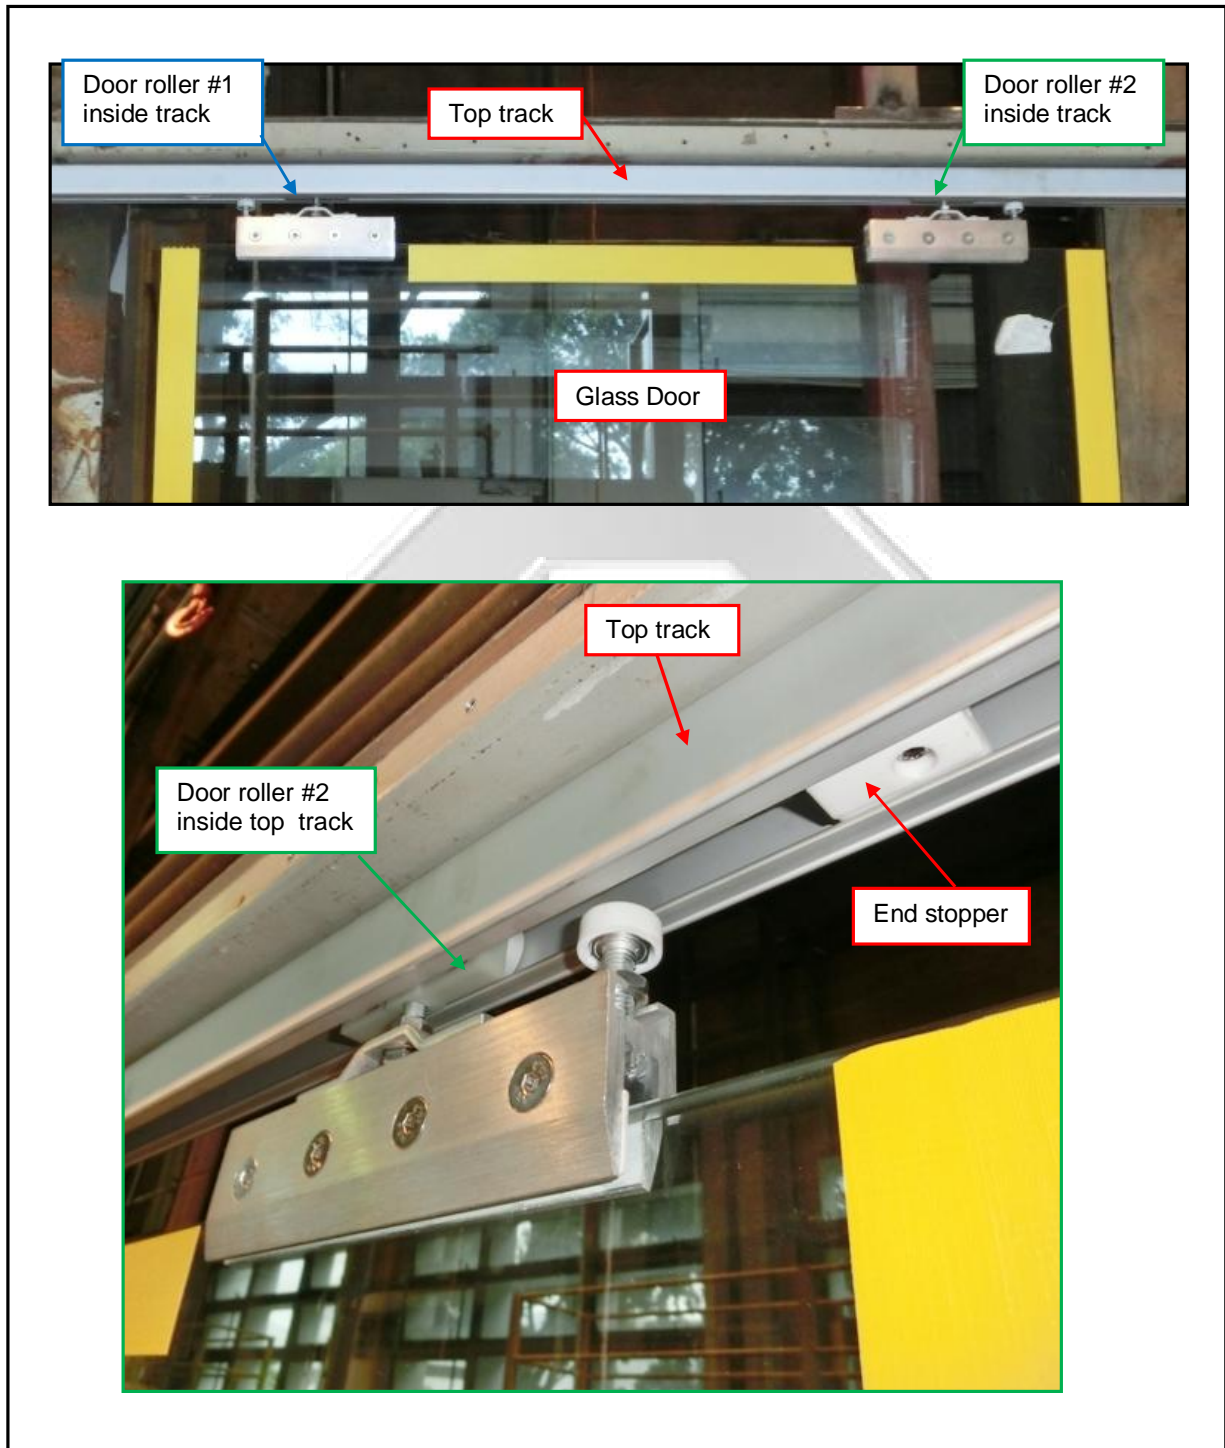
Installation of CKS-SL890 door roller at the top of glass door
